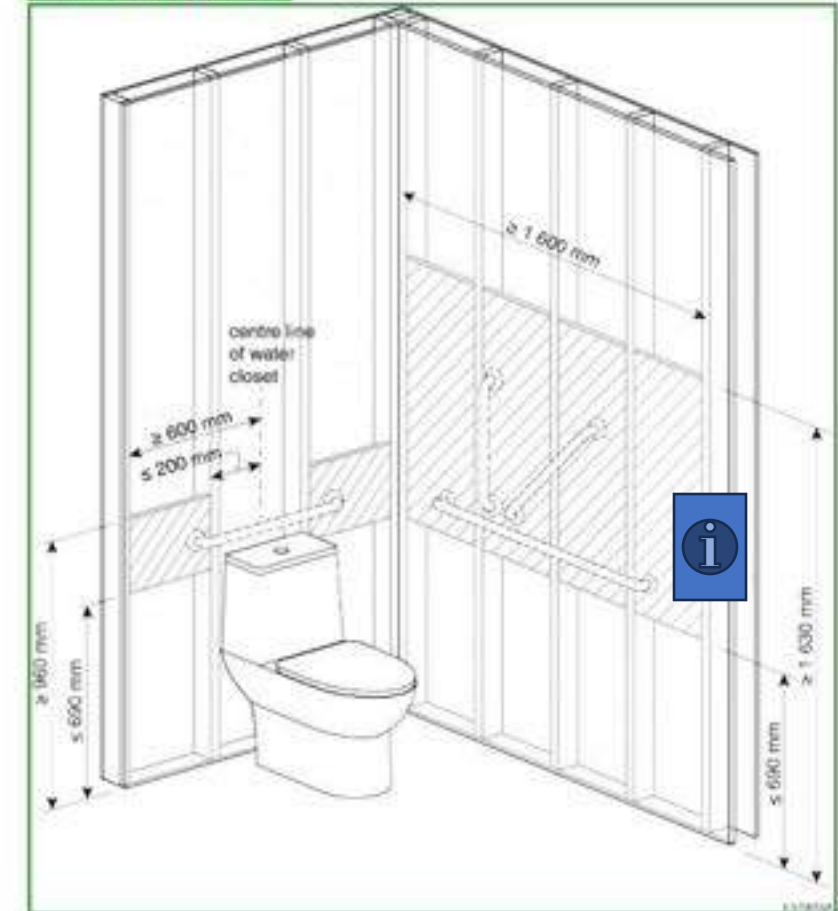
(2) illustrates an example of an acceptable configuration for the reinforcement of stud walls around a water closet. Possible grab bar configurations are also shown.
